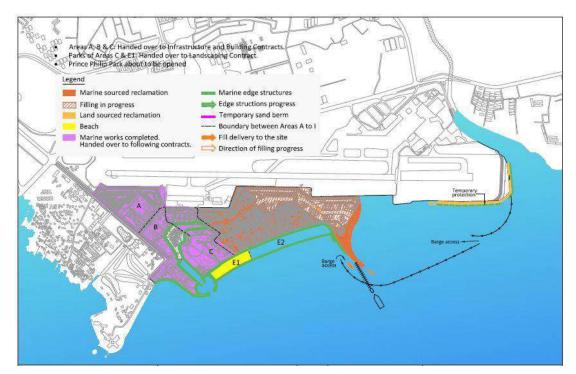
Drawing No 103 - works progressing south with the first section of beach sand placed
